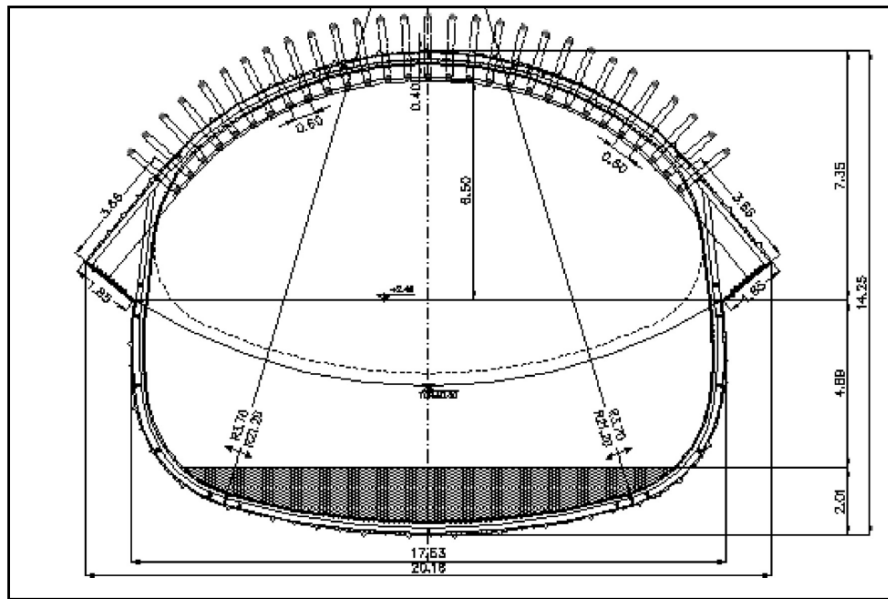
Excavation geometry of the typical cross section (maximum enlargement) [7]
